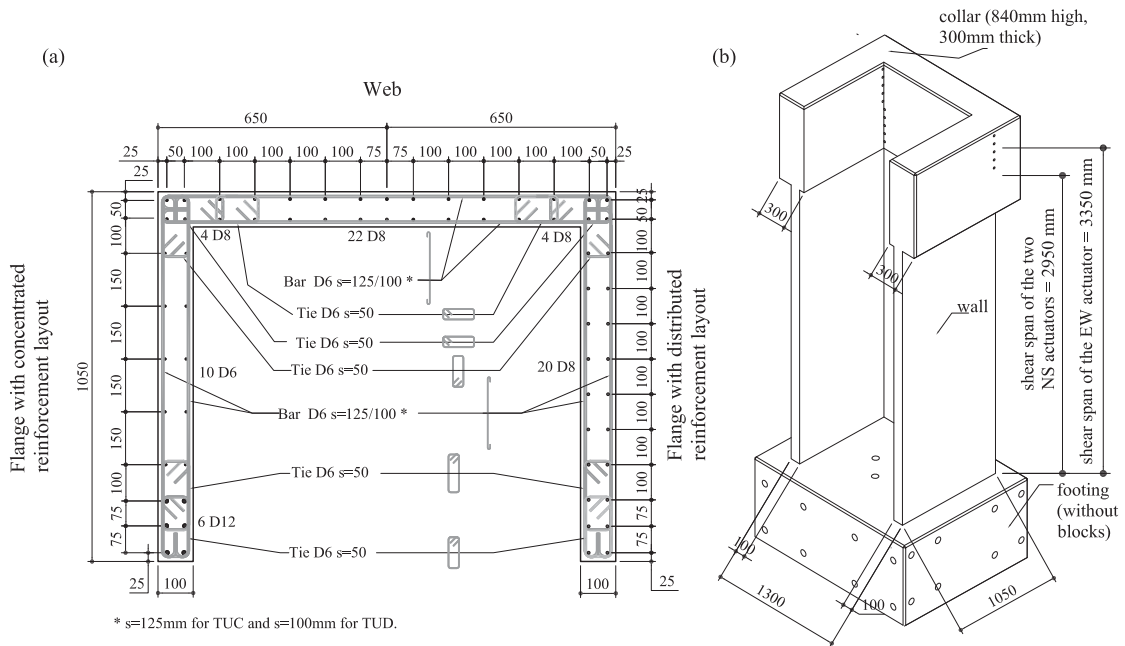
Test units TUC and TUD: cross-section and reinforcement layout (a) and elevation (b)
